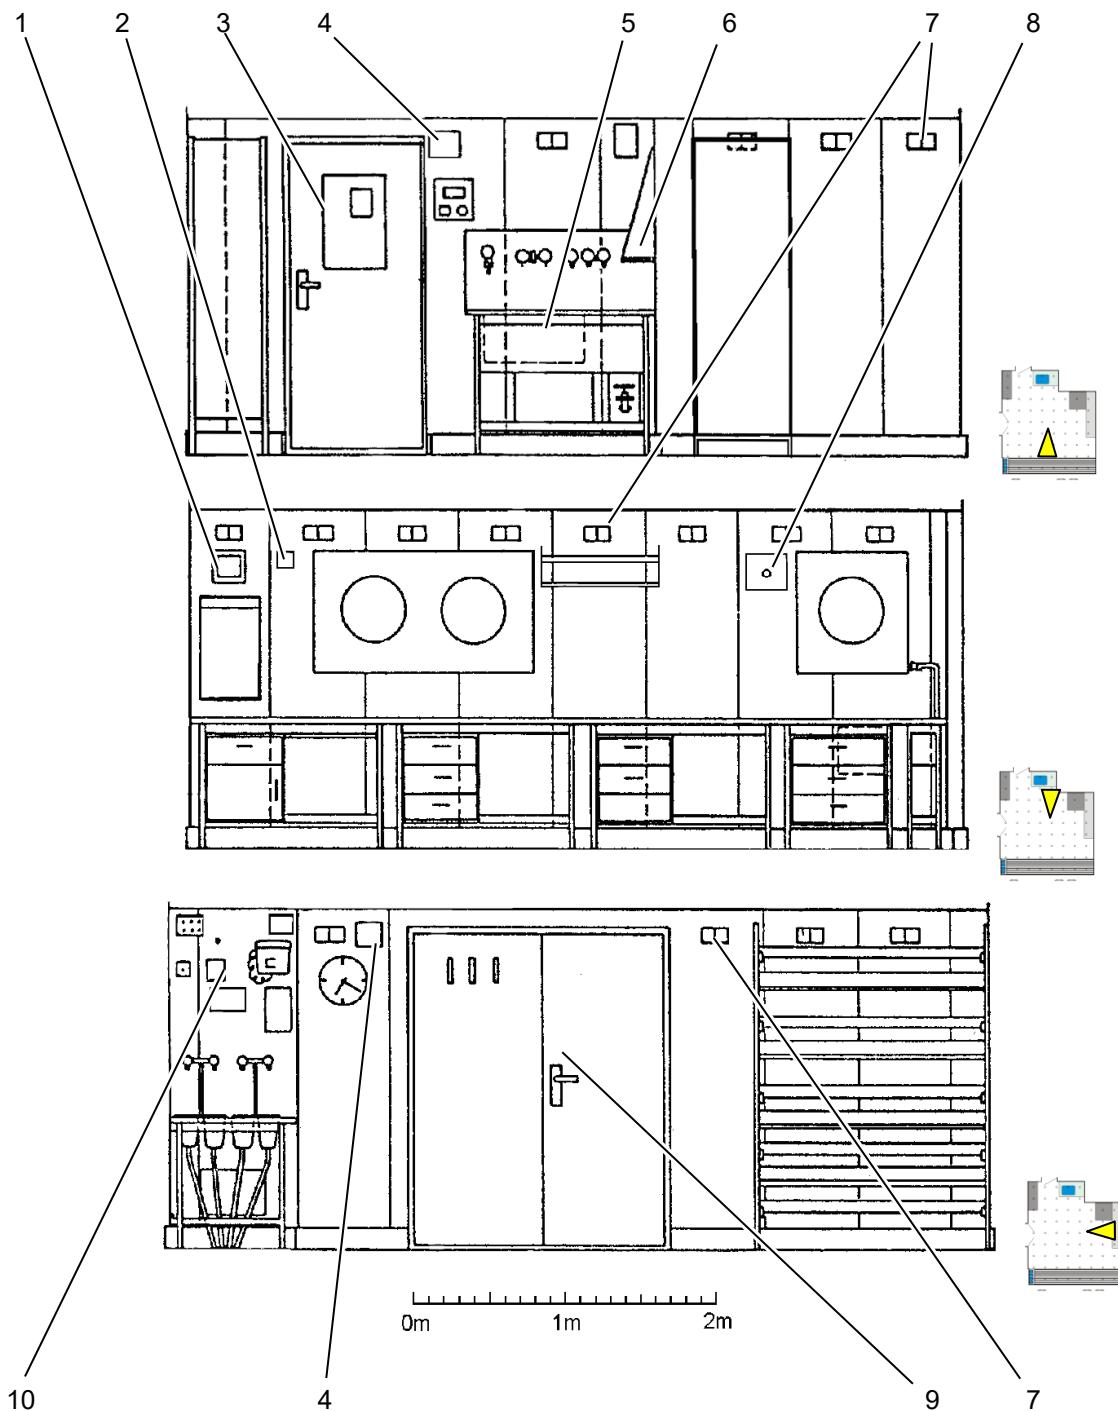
Universal laboratory 15 (detailed plan of laboratory walls, version 1986)
